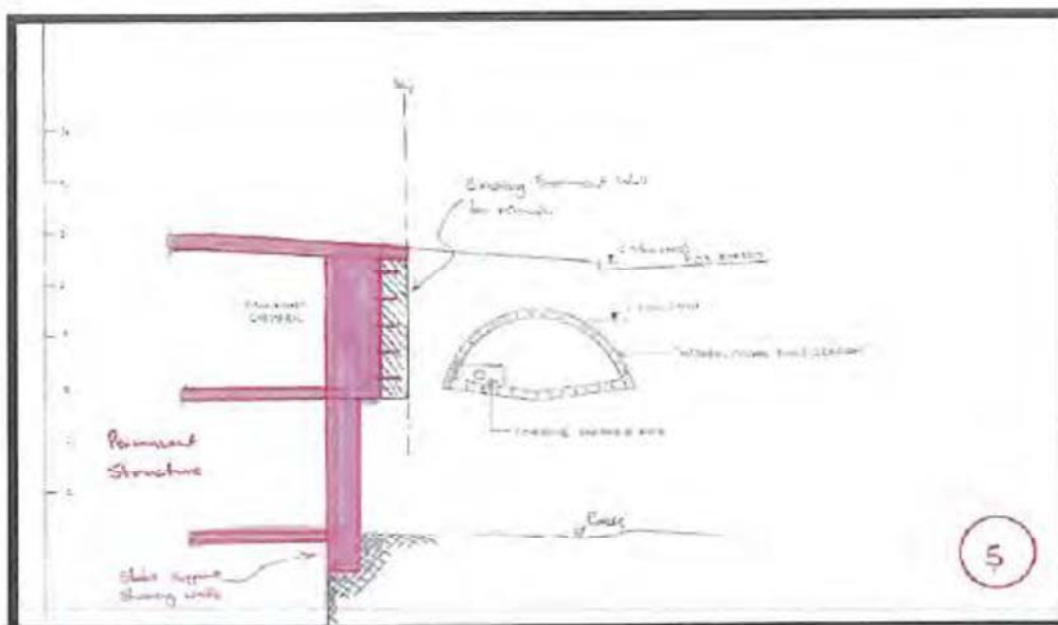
Northrop Engineering plan showing the temporary bracing. Shows the permanent part-retaining wall to structurally brace the existing basement wall so that the extended basement (downwards) will not affect the structural integrity of the Tank Stream. Rappoport 2010: 71.
